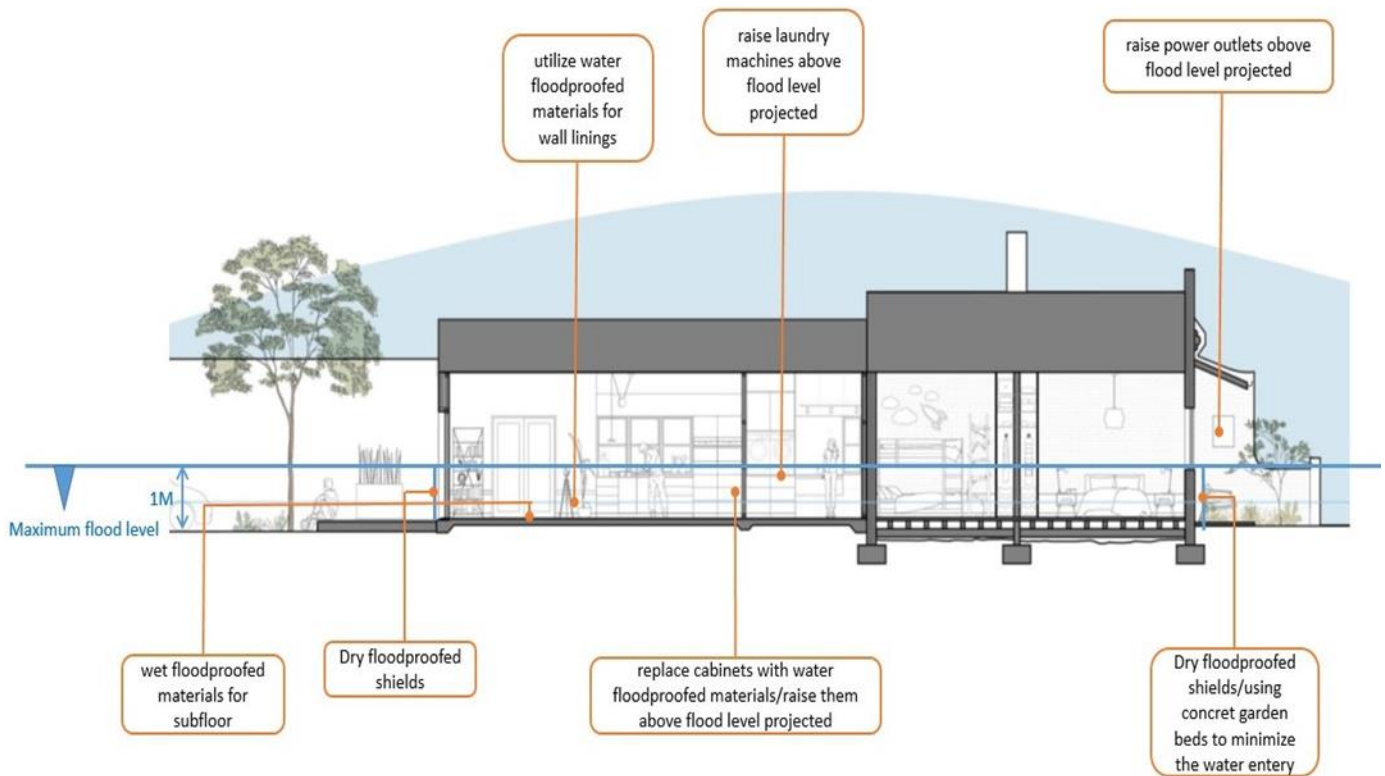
Illustrates how water floodproof strategy can be installed in a building with combination of dry-flood proof shields. (Figure of the building adopted from (JDA, 2020))
